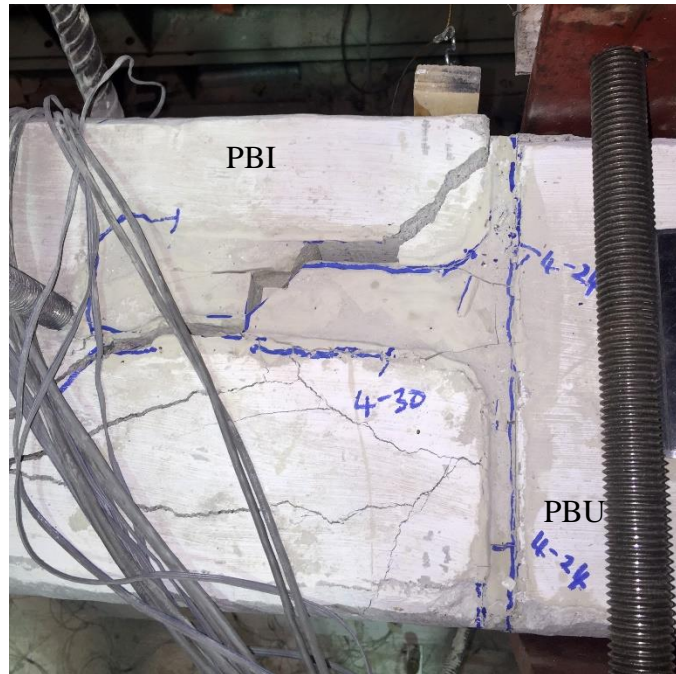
Beam used to brace PBU with respect to the deck during Test 4
